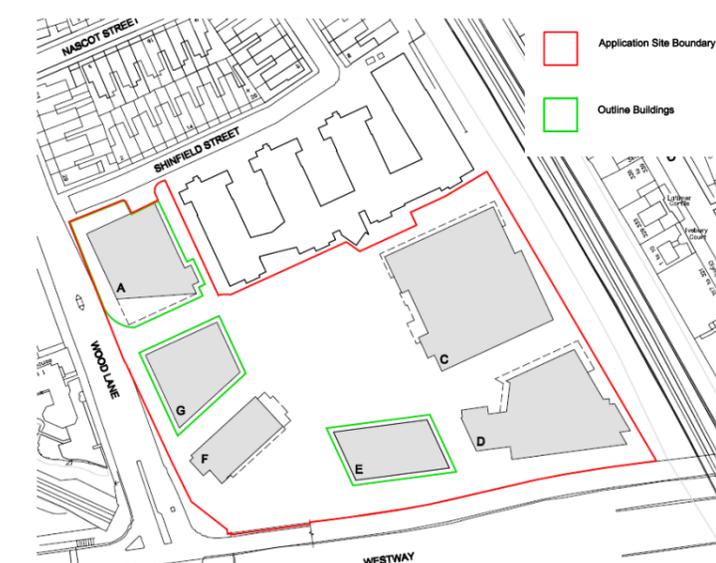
Plot Boundary Plan with Outline Application Buildings
